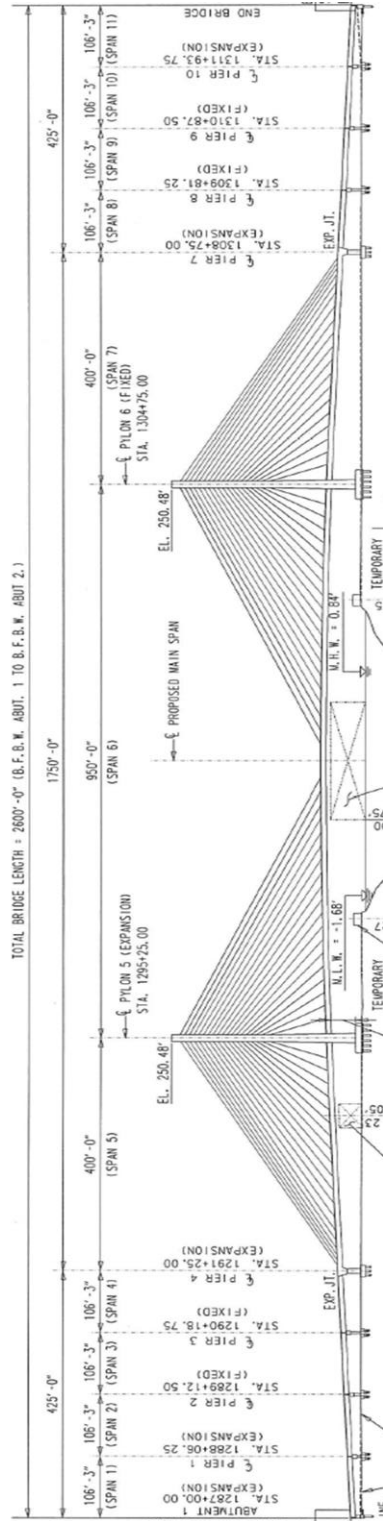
Elevation View of the Indian River Inlet Bridge
